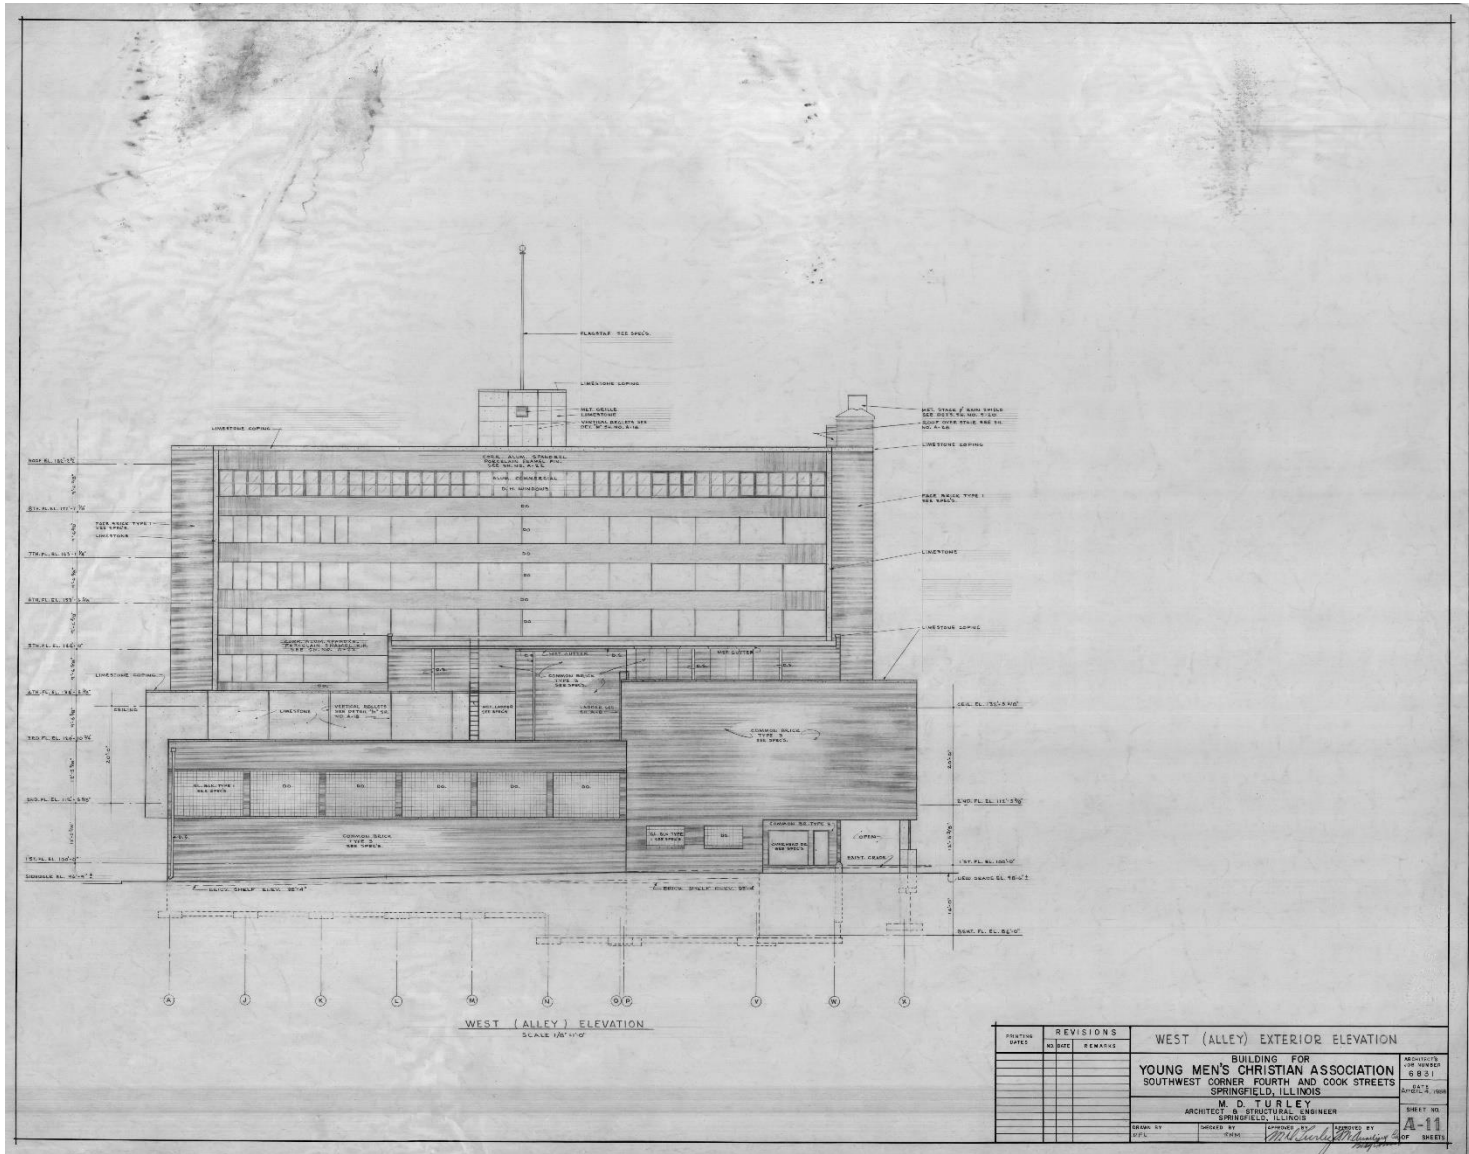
West (Alley) Exterior Elevaton (Turley 1958; Sheet No. A-11).
